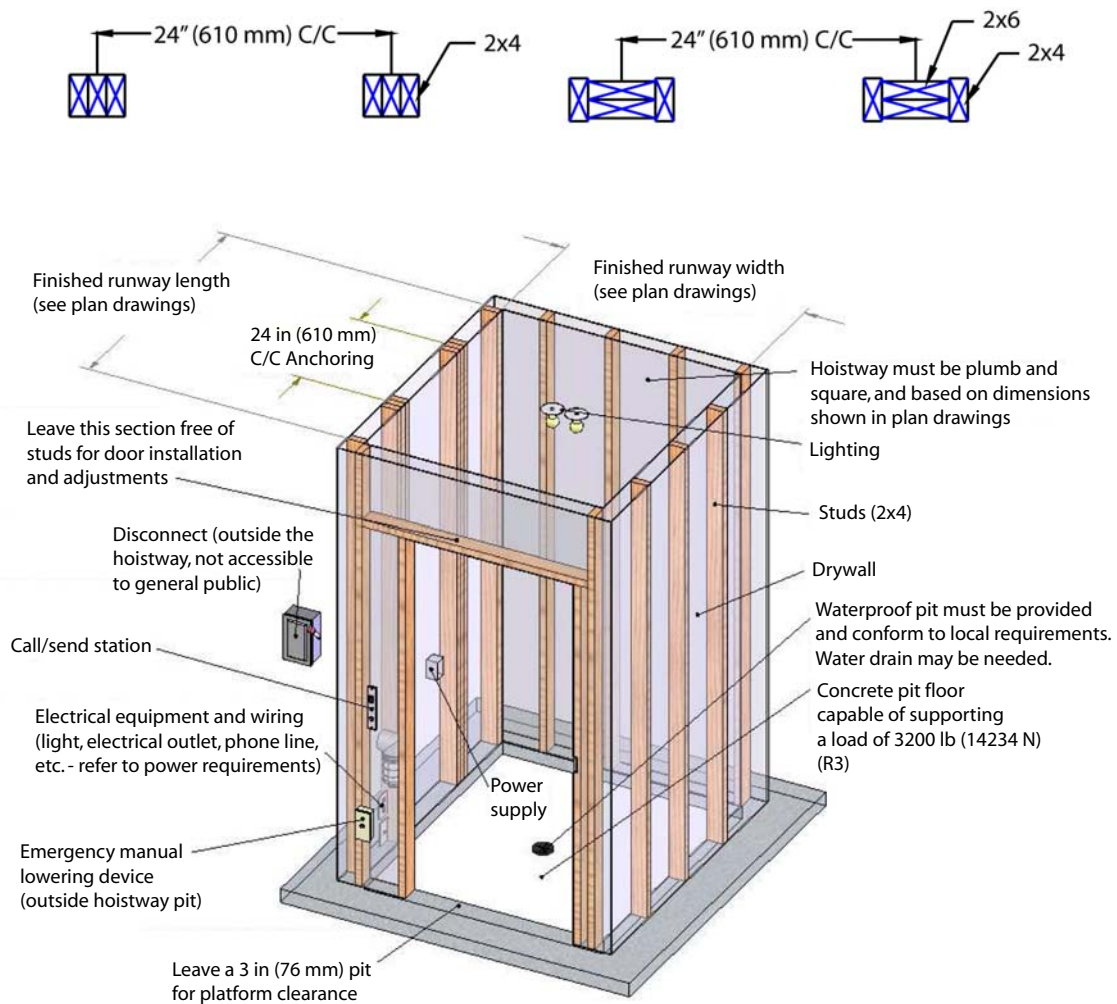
illustrates the recommended steps for constructing a wooden hoistway.
